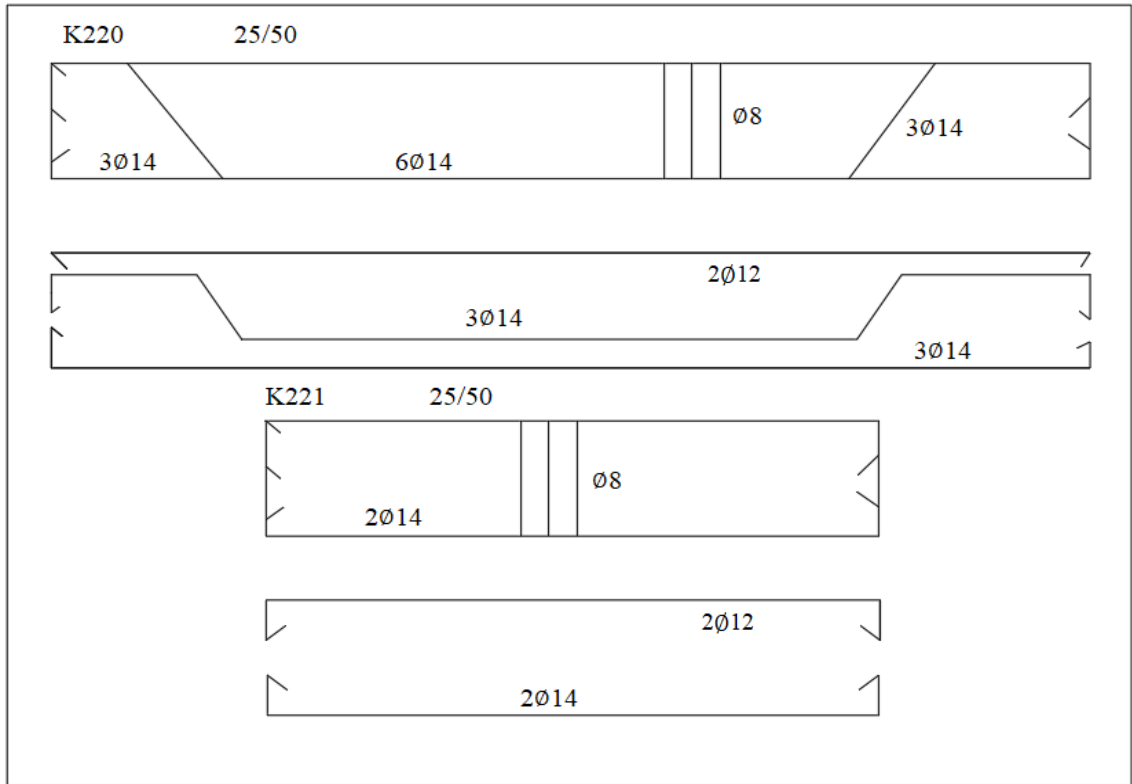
Reinforcement rebar of beams of studied building (K220 and K221)
